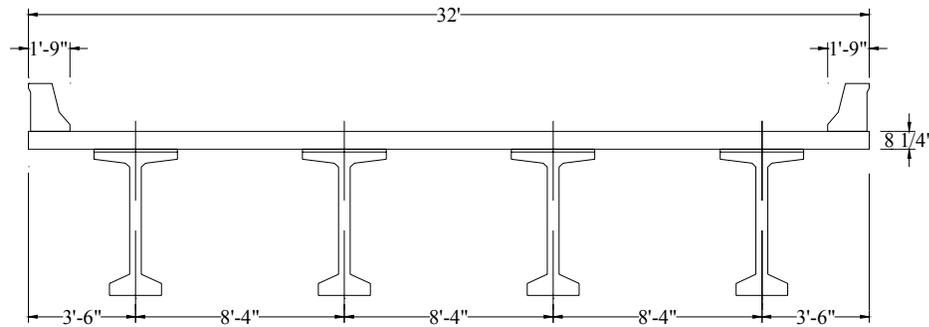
Typical Cross Section of Prestressed Concrete Bulb-Tee Girder Bridge
